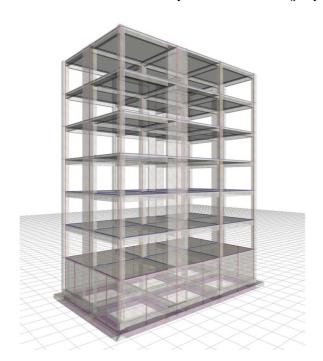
Structure and model Ductile wall system in X and Y with q=3.60
